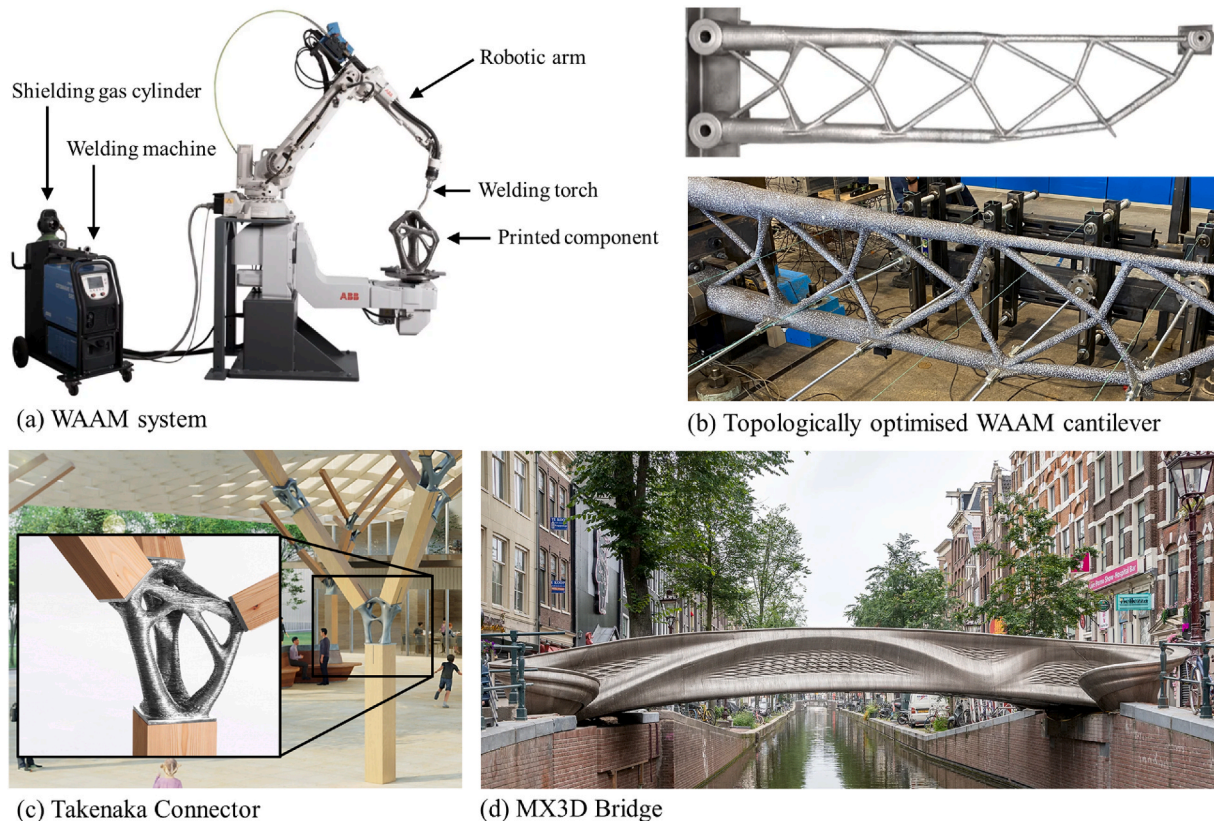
(a) Principal components of a WAAM system. Examples of the application of WAAM in construction: (b) Topologically optimised WAAM cantilever under structural testing at Imperial College London; (c) The Takenaka Structural Steel Connector; (d) The MX3D Bridge in Amsterdam. Source: MX3D (2022).
